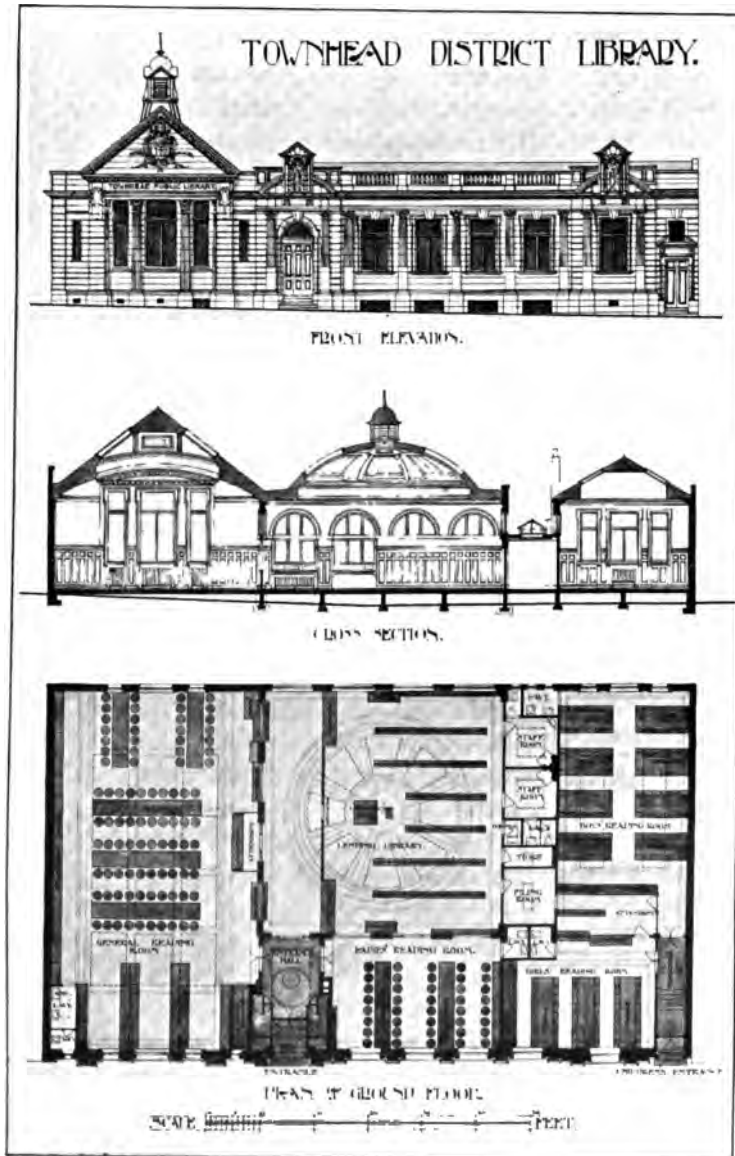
Glasgow Branch Library, Plan and Elevation (Section 118).
